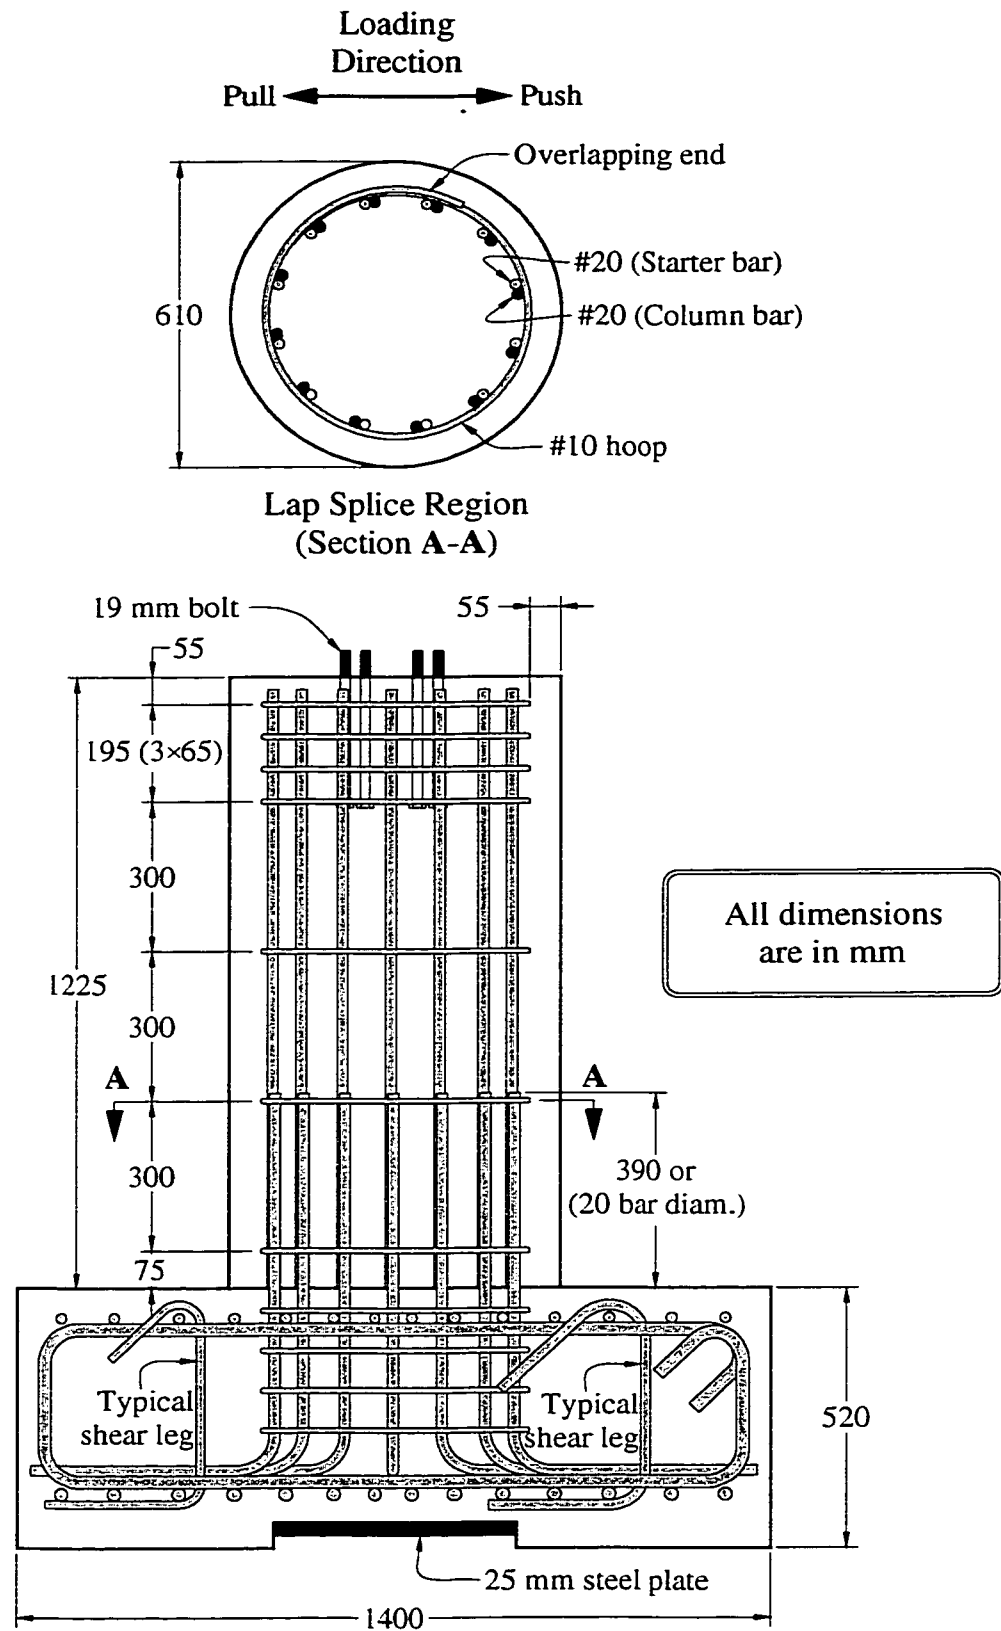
Dimensions and reinforcement details for columns BR-C10 and BR-C11
